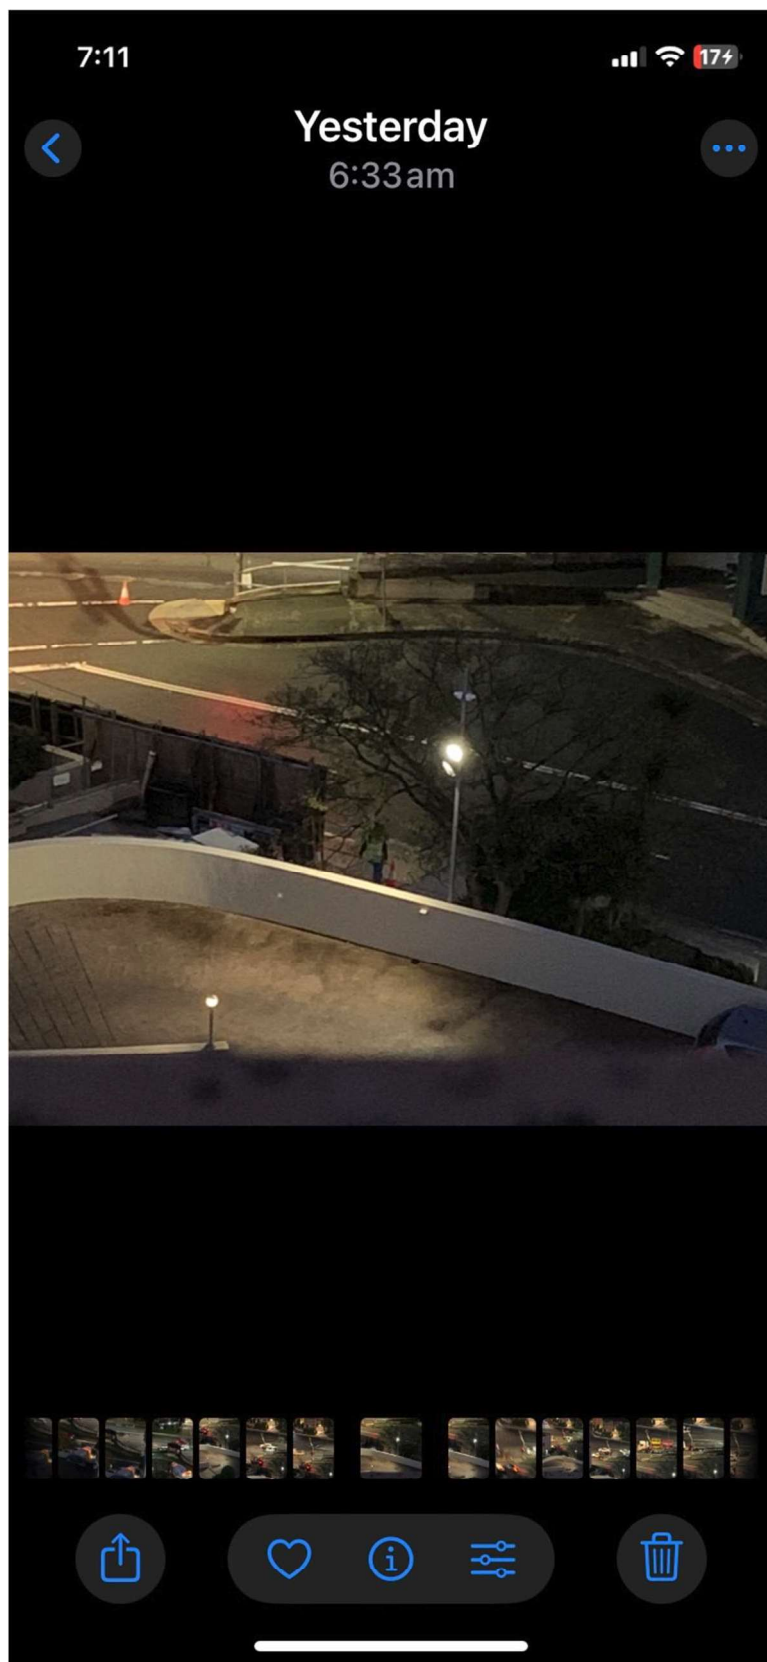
The site gates (need light in middle of photo) are open and a worker is moving a traffic cone. There is a traffic cone placed on the road adjacent to the footpath at the intersection of the western side of New South Head Road and Darling Point Road.
